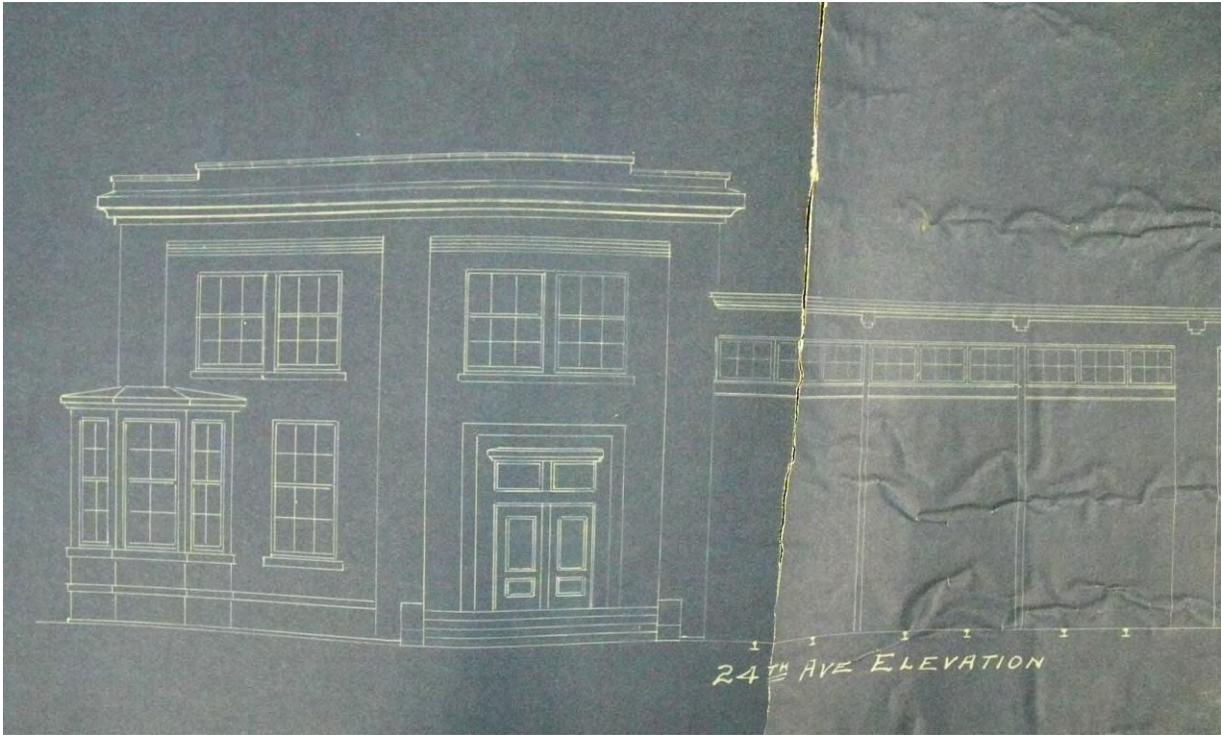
24th Avenue elevation, foreman's office bay window, main entrance, streetcar shed bay doors, source: Northwest Architectural Archives
